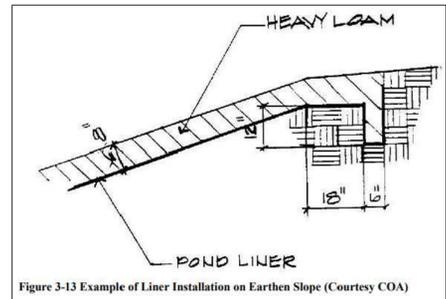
Example of Liner Installation on Earthen Slope (Courtesy COA)
